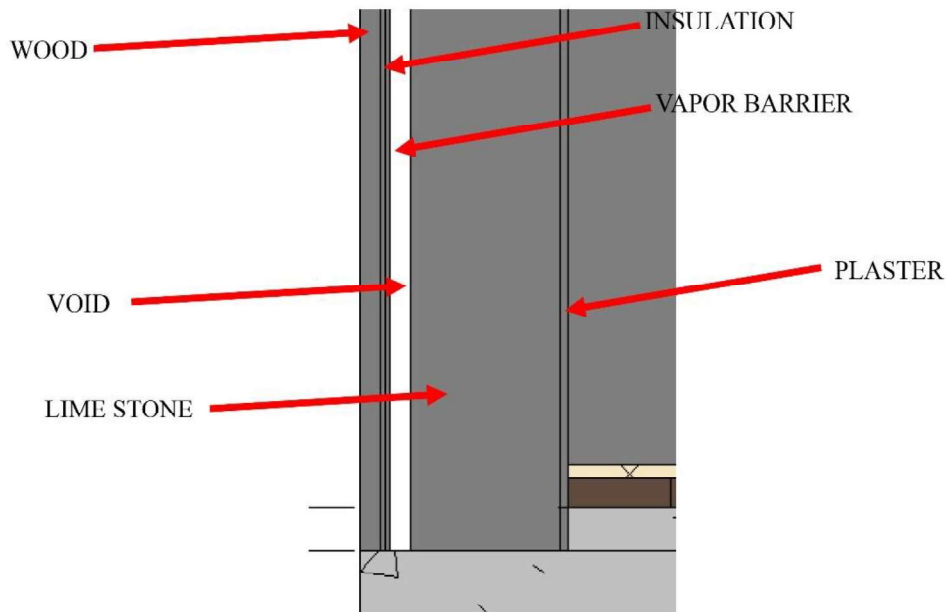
Wall section showing construction materials. Source: Revit Autodesk 2020 by Author
